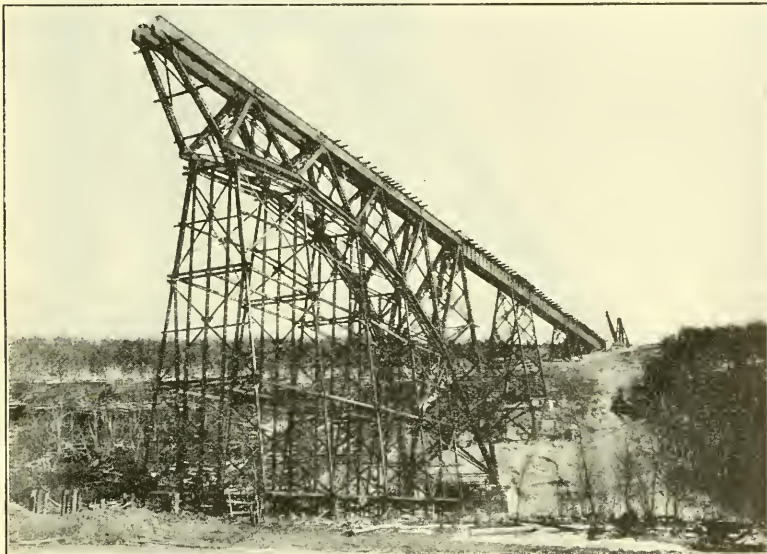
ERECTION OF EAST ARCH, ST. CROIX RIVER BRIDGE.
